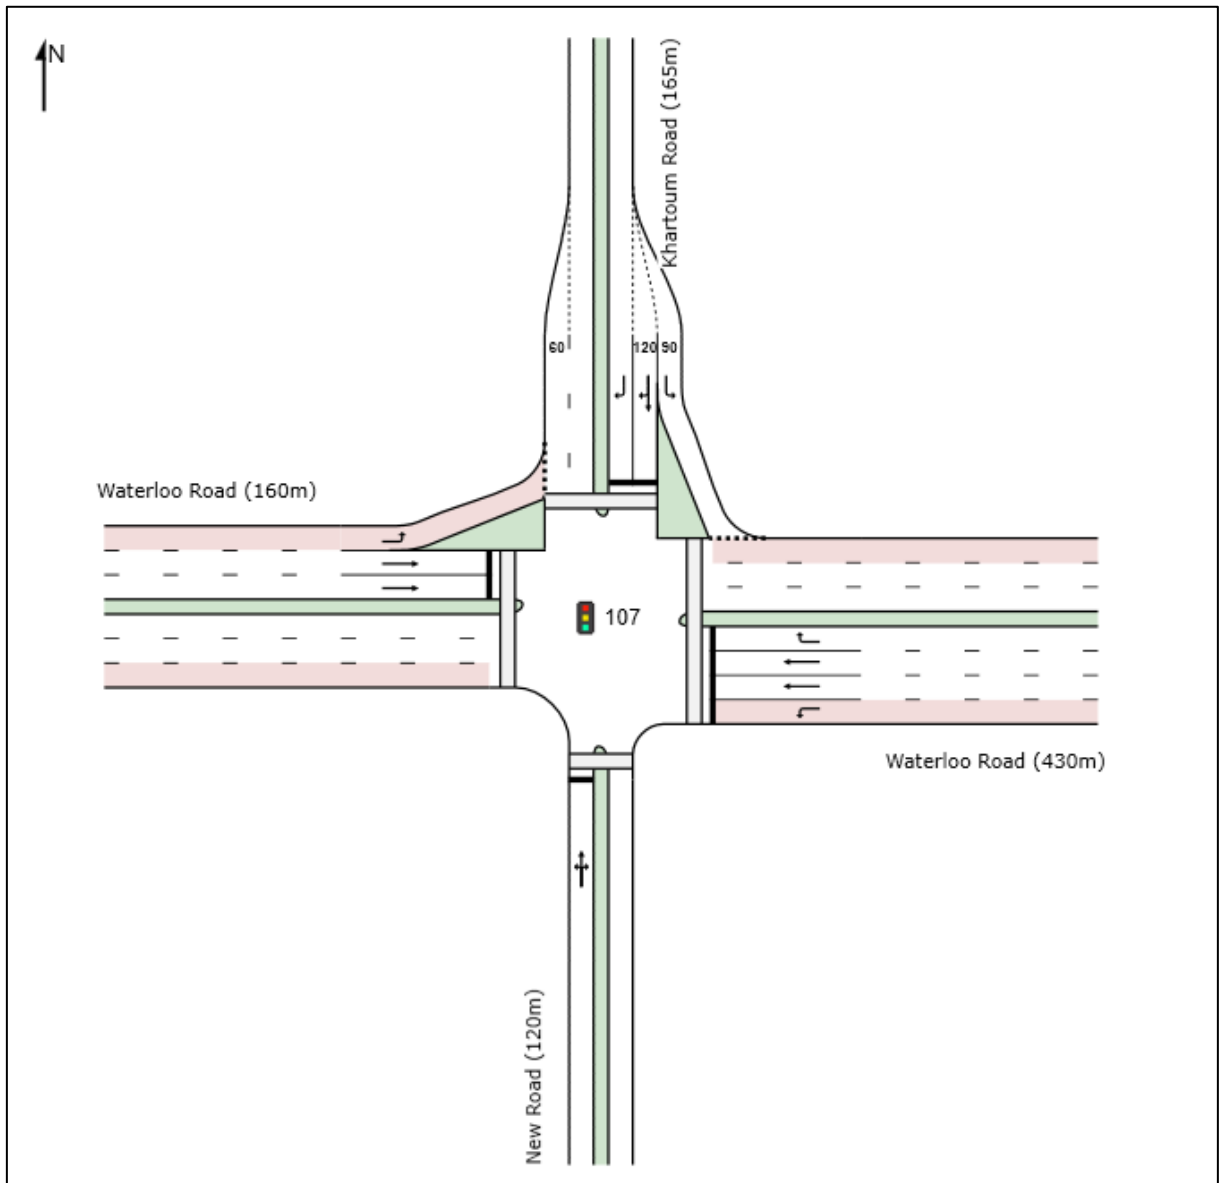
Khartoum Road / Waterloo Road – Future Intersection Layout
